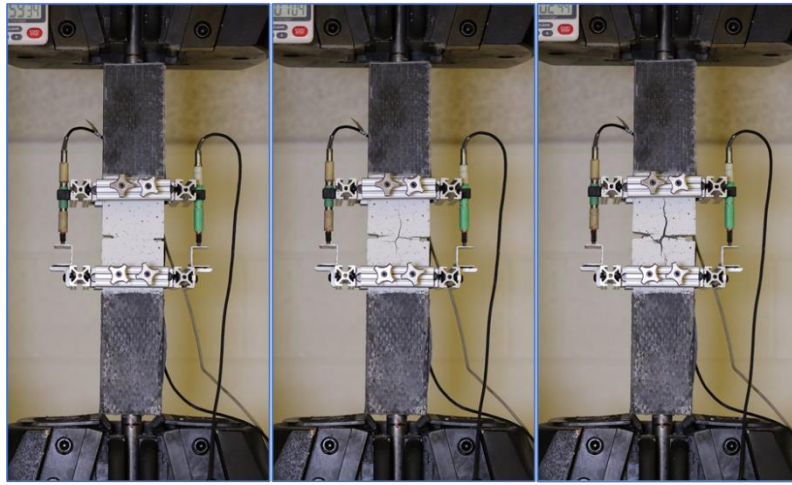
22: Typical crack pattern in a notched tension stiffening specimen
